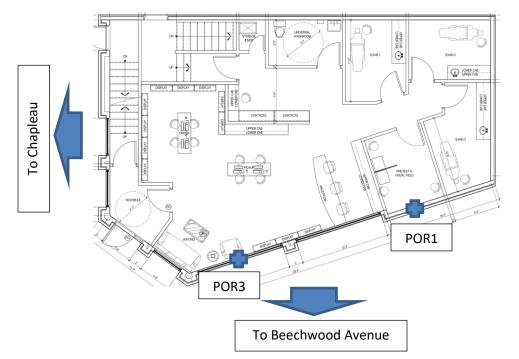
Floor Plan of the 1st floor showing the Plane of Window Point of Reception POR1.
